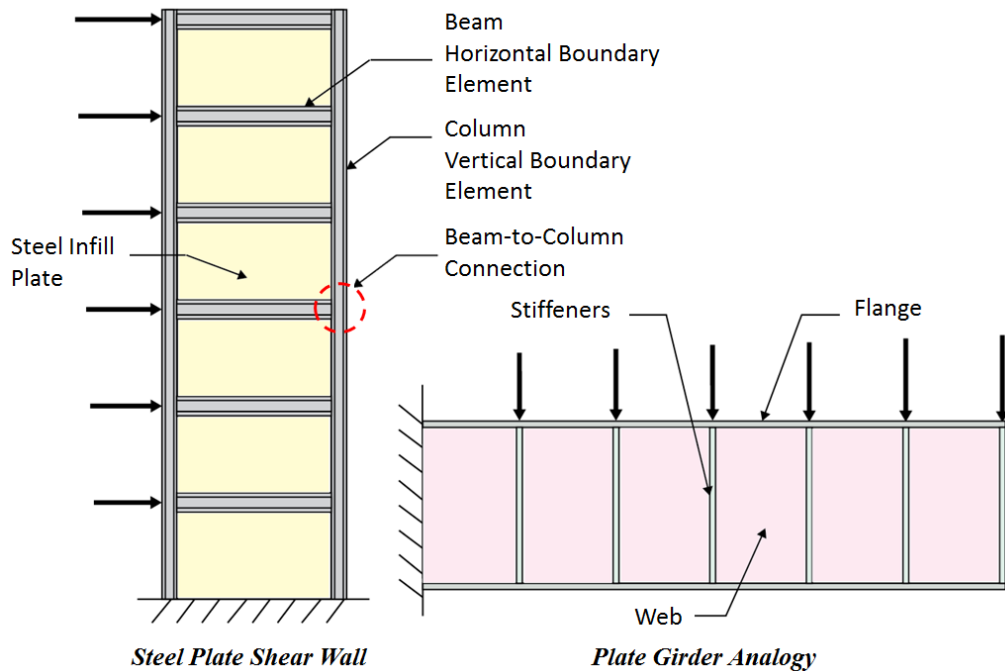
Schematic of the structural components of an SPSW system and the plate girder analogy
